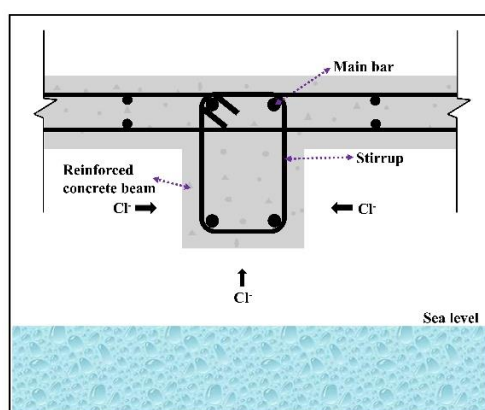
Schematic diagram of main bar and stirrups in reinforced concrete
